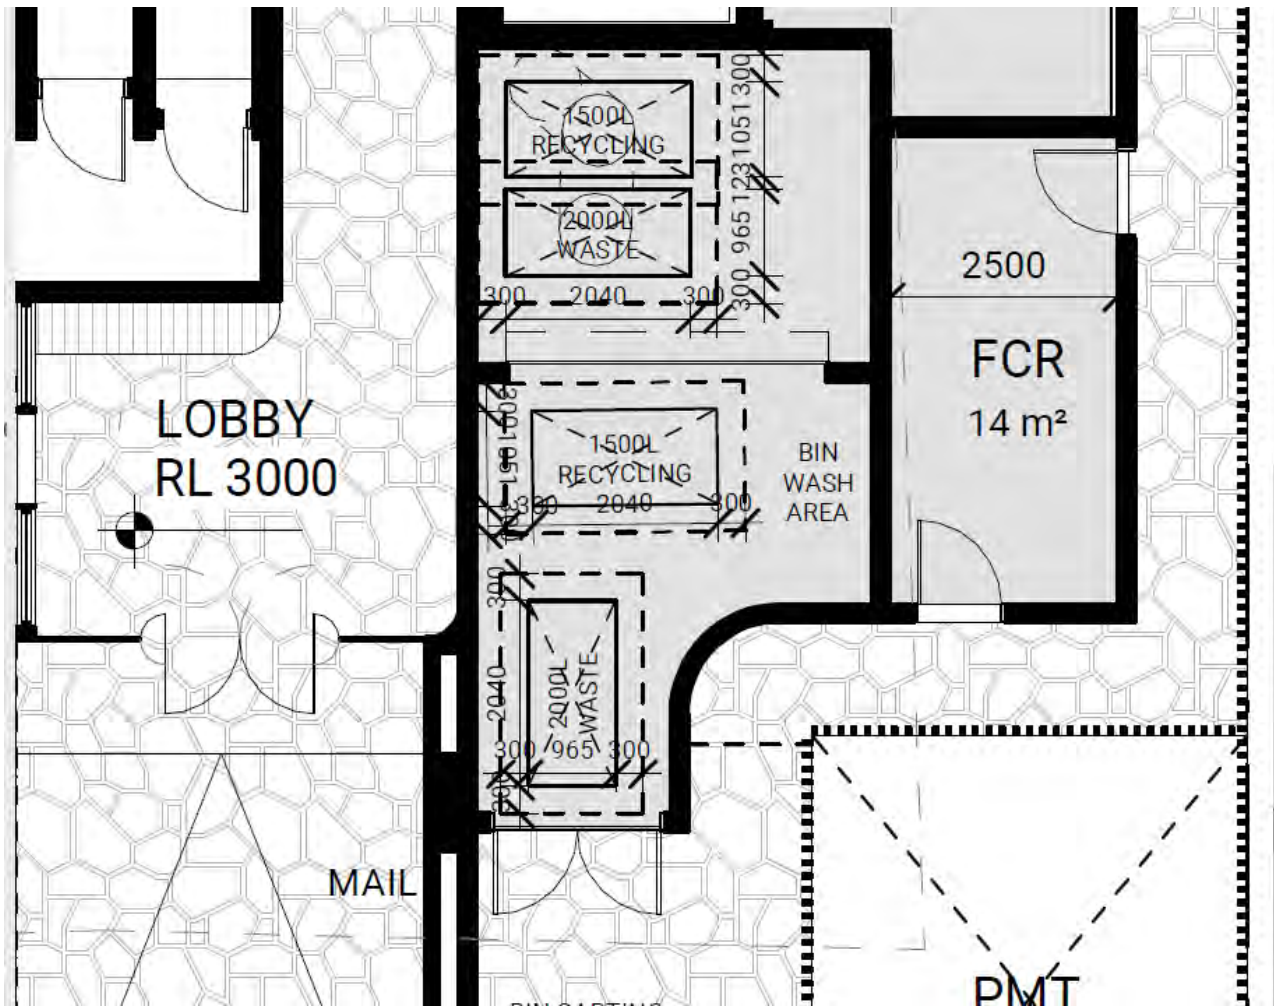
Refuse Room Layout (Source: Plus architecture, DA100 Ground Level Floor Plan, Nov 2022)
